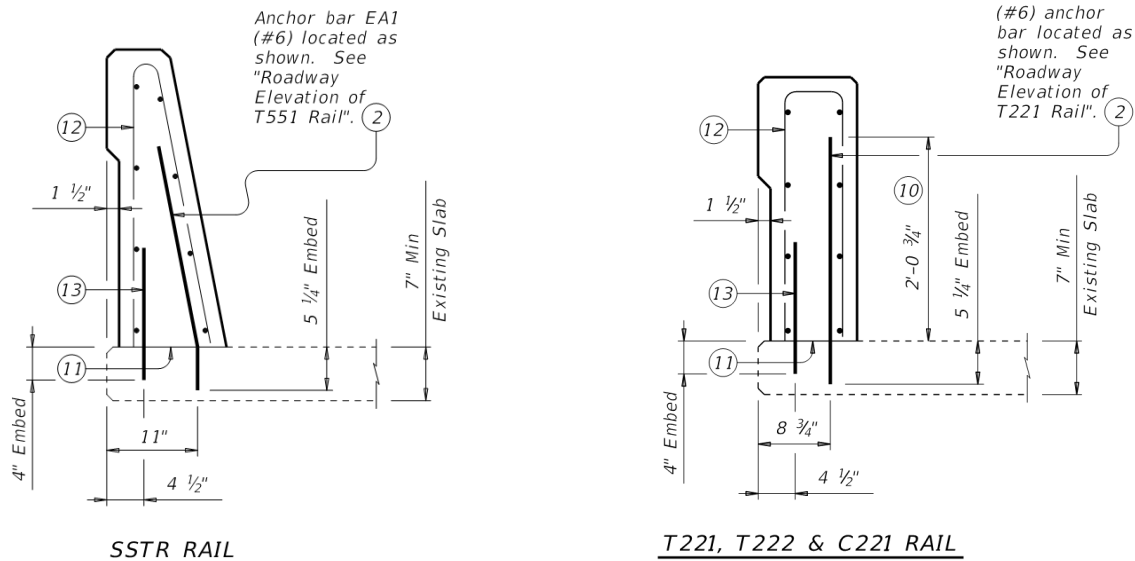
Examples of concrete railing retrofit design with adhesive anchors. TxDOT railing types SSTR and T222 are approved for MASH TL-4, 36" high.
